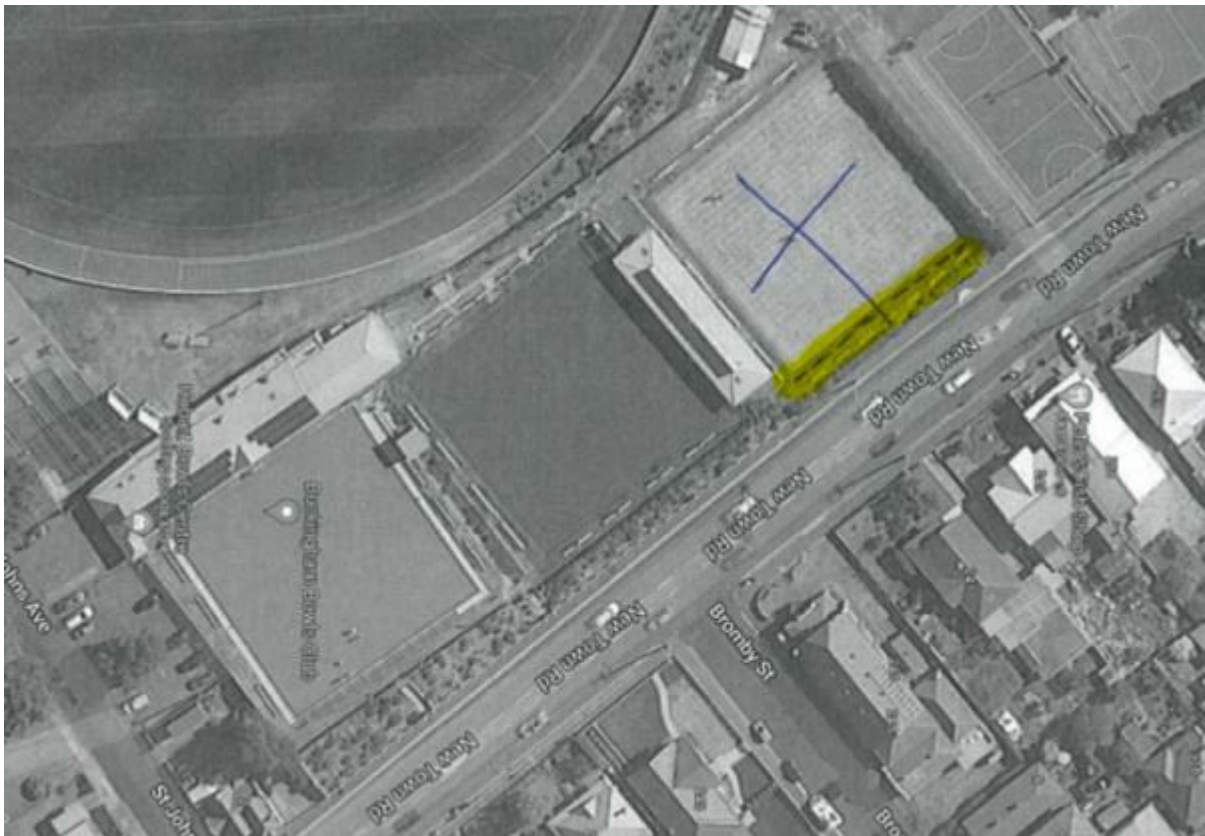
Site plan showing the bowling green to be converted to two netball courts, and the location of the proposed galvanised chain wire fence. Source: Application documents.
